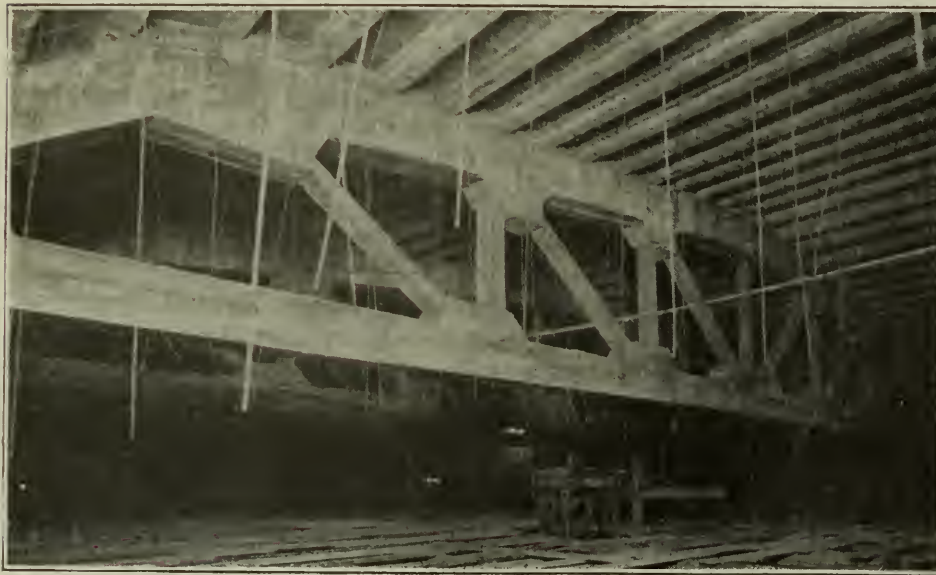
CONCRETE TRUSS OF 82 FT. SPAN FOR THEATER
